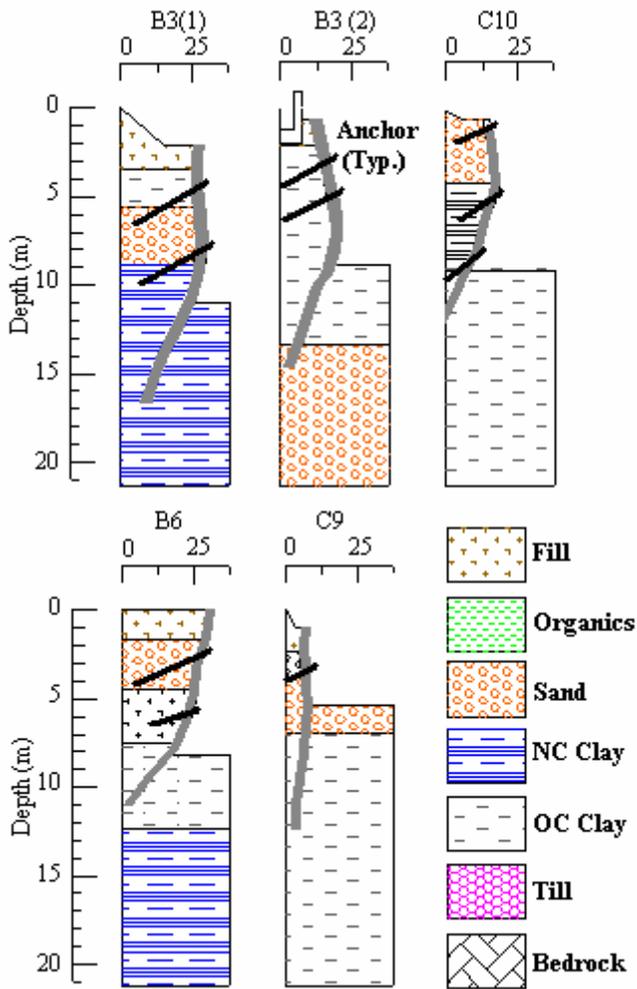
(b): Typical sections-wall deformations  $\delta H$  (mm) for floating excavations with soil anchors and inclined rakers continued from 5(a)
